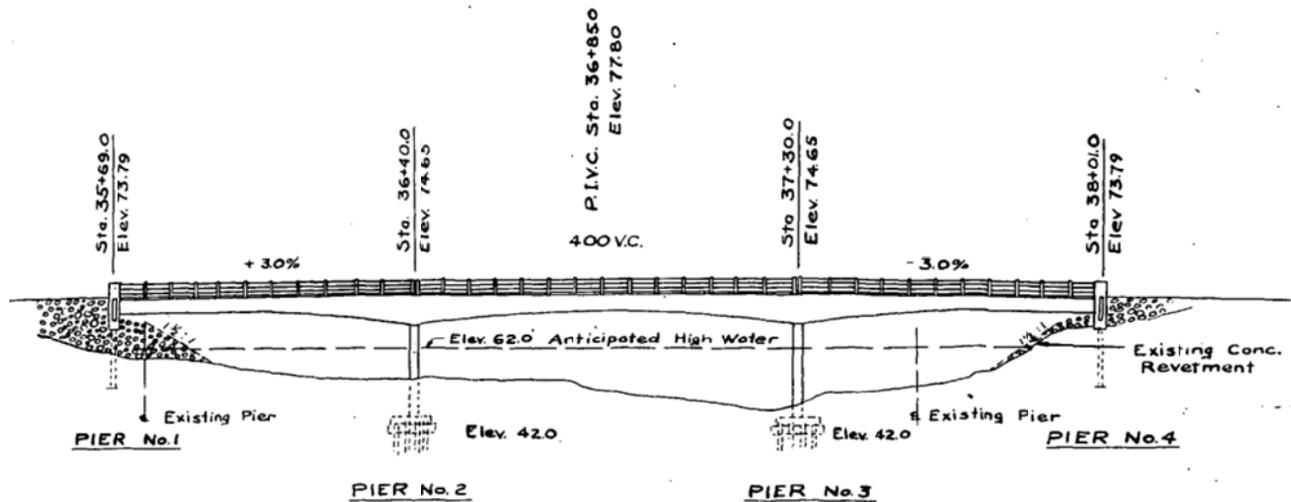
Bridge profile (looking upstream) extracted from the 1952 construction drawings. Elevations are relative to NGVD 29; see text below for additional explanation.
